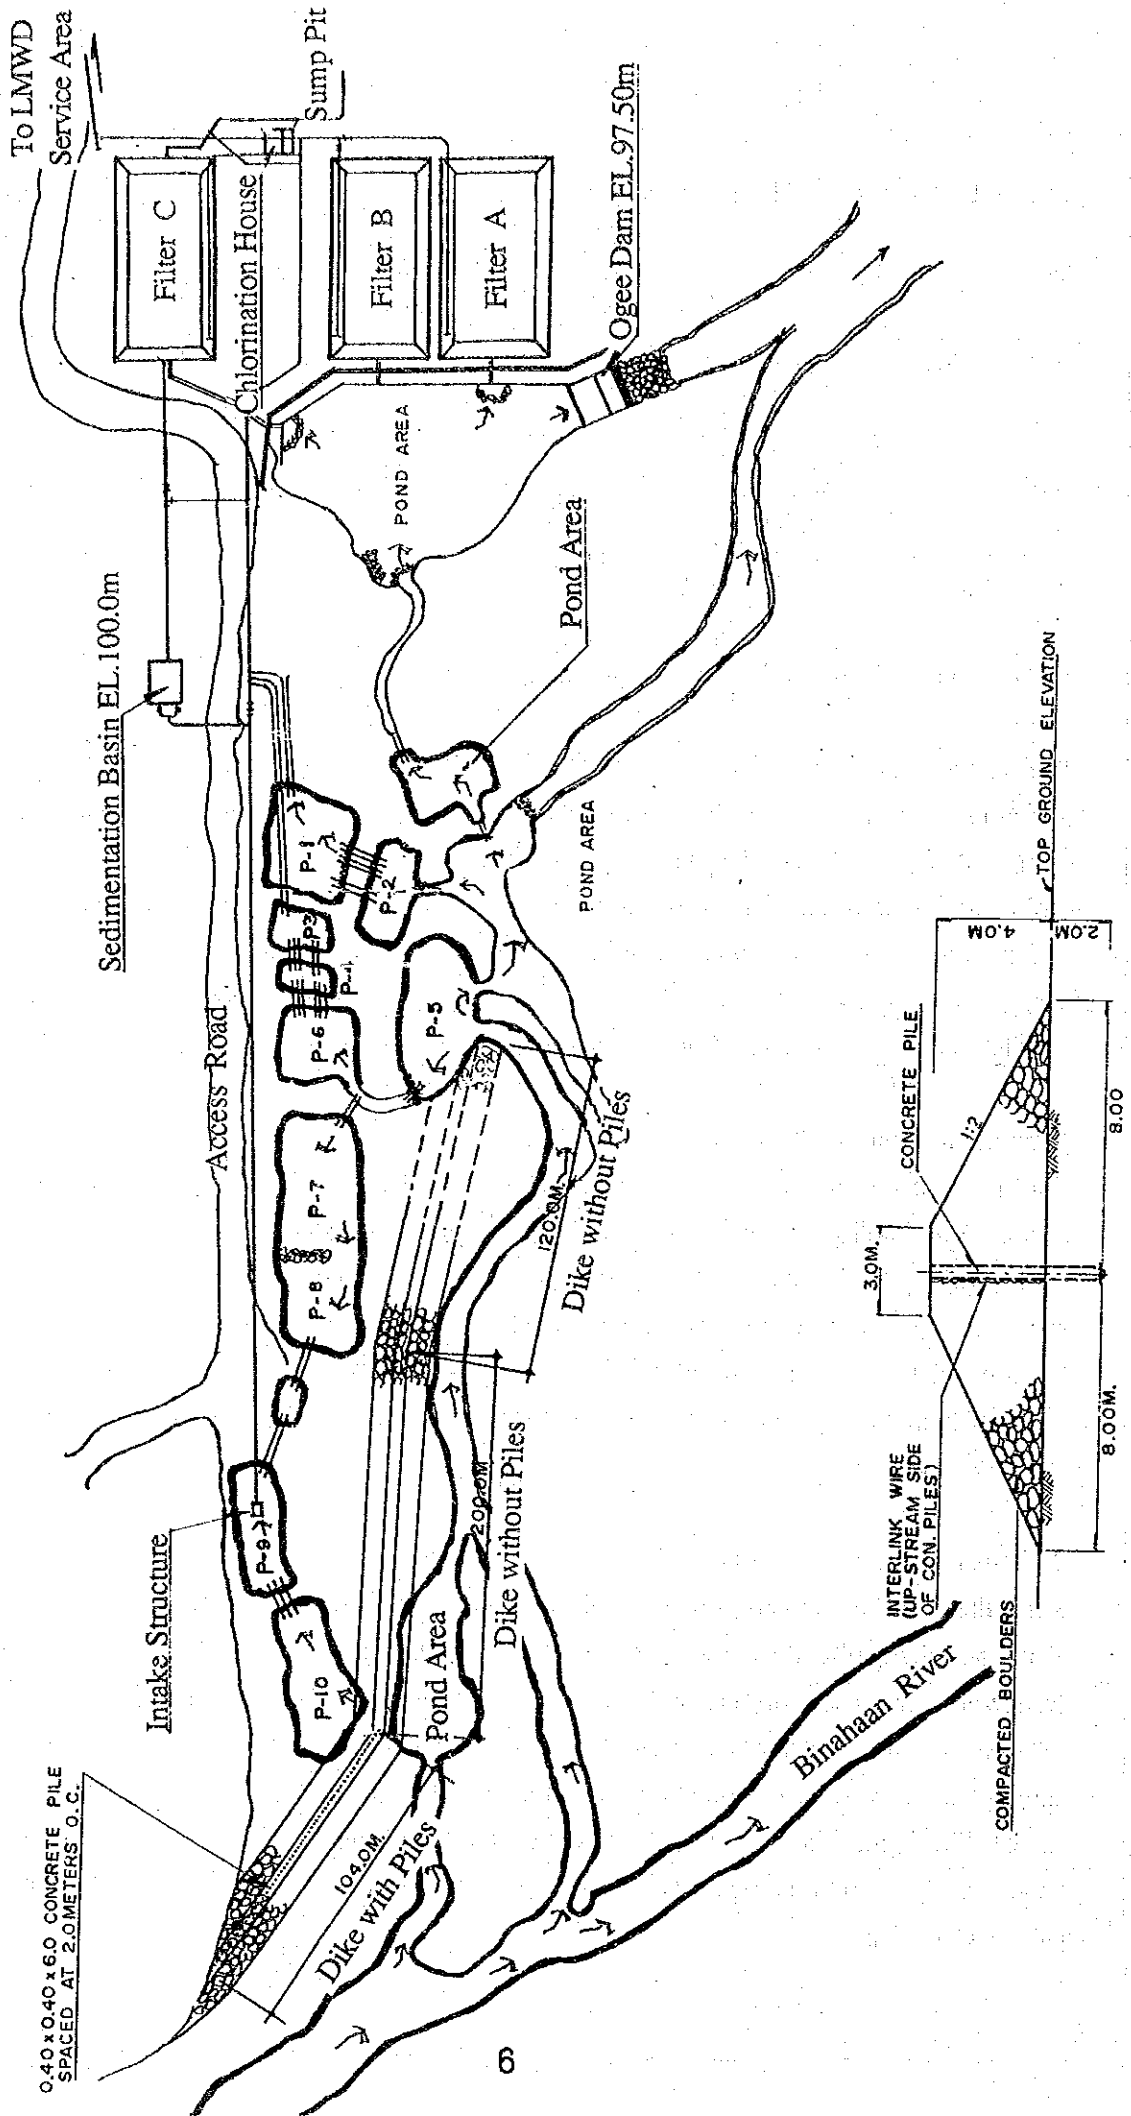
Emergency Rehabilitation Plan for Tingib Treatment Plant
